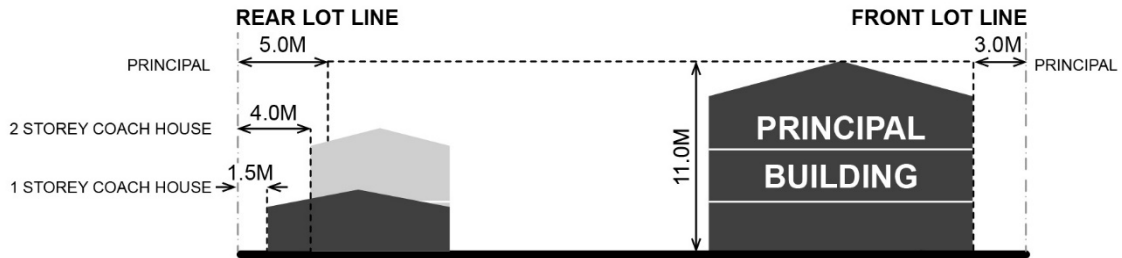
R1.2 Principal Building and SSMFH Coach House Setbacks Cross Section
